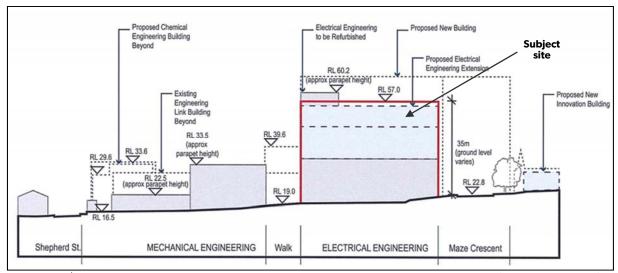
| CIP – approved building envelopes for Engineering Precinct east–west section (source: SSD 6123)
